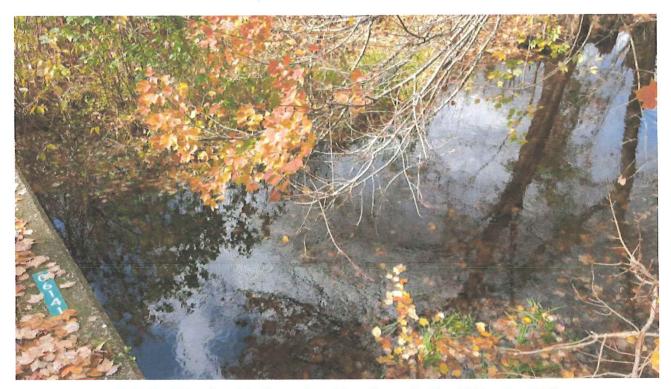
Abbey Brook facing northwest from the north side of Bridge No. 06141
